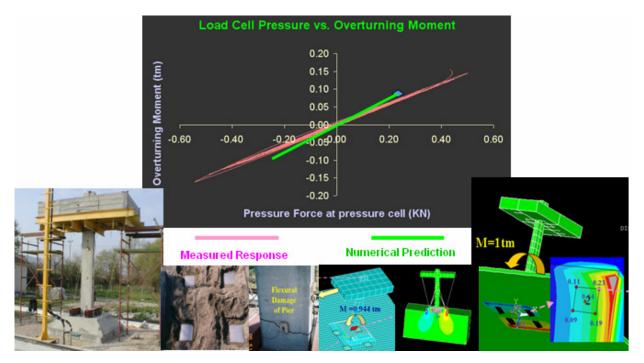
Variation of load cell pressure with overturning moment. Test of 8<sup>th</sup> June (after pier cracking). Pier with cables and struts.
